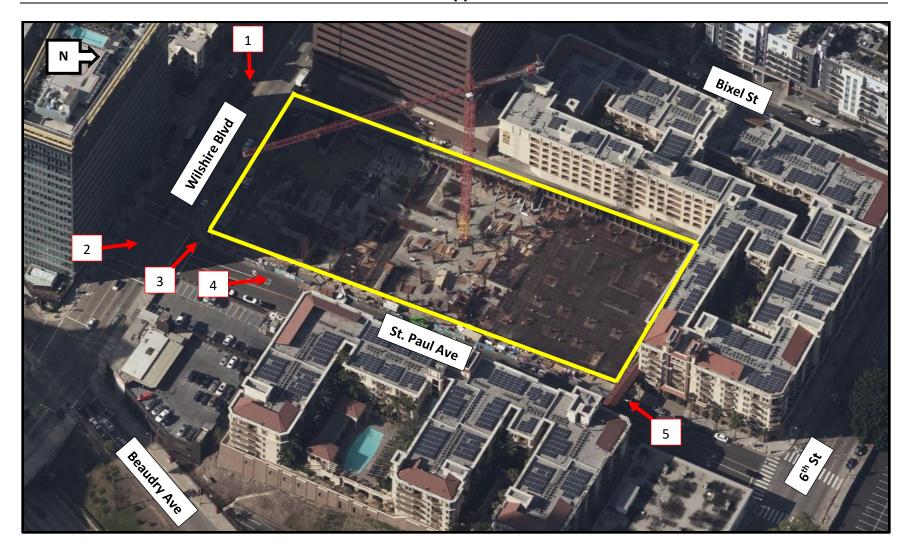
Wilshire Boulevard Master Plan Approval - Cafe
